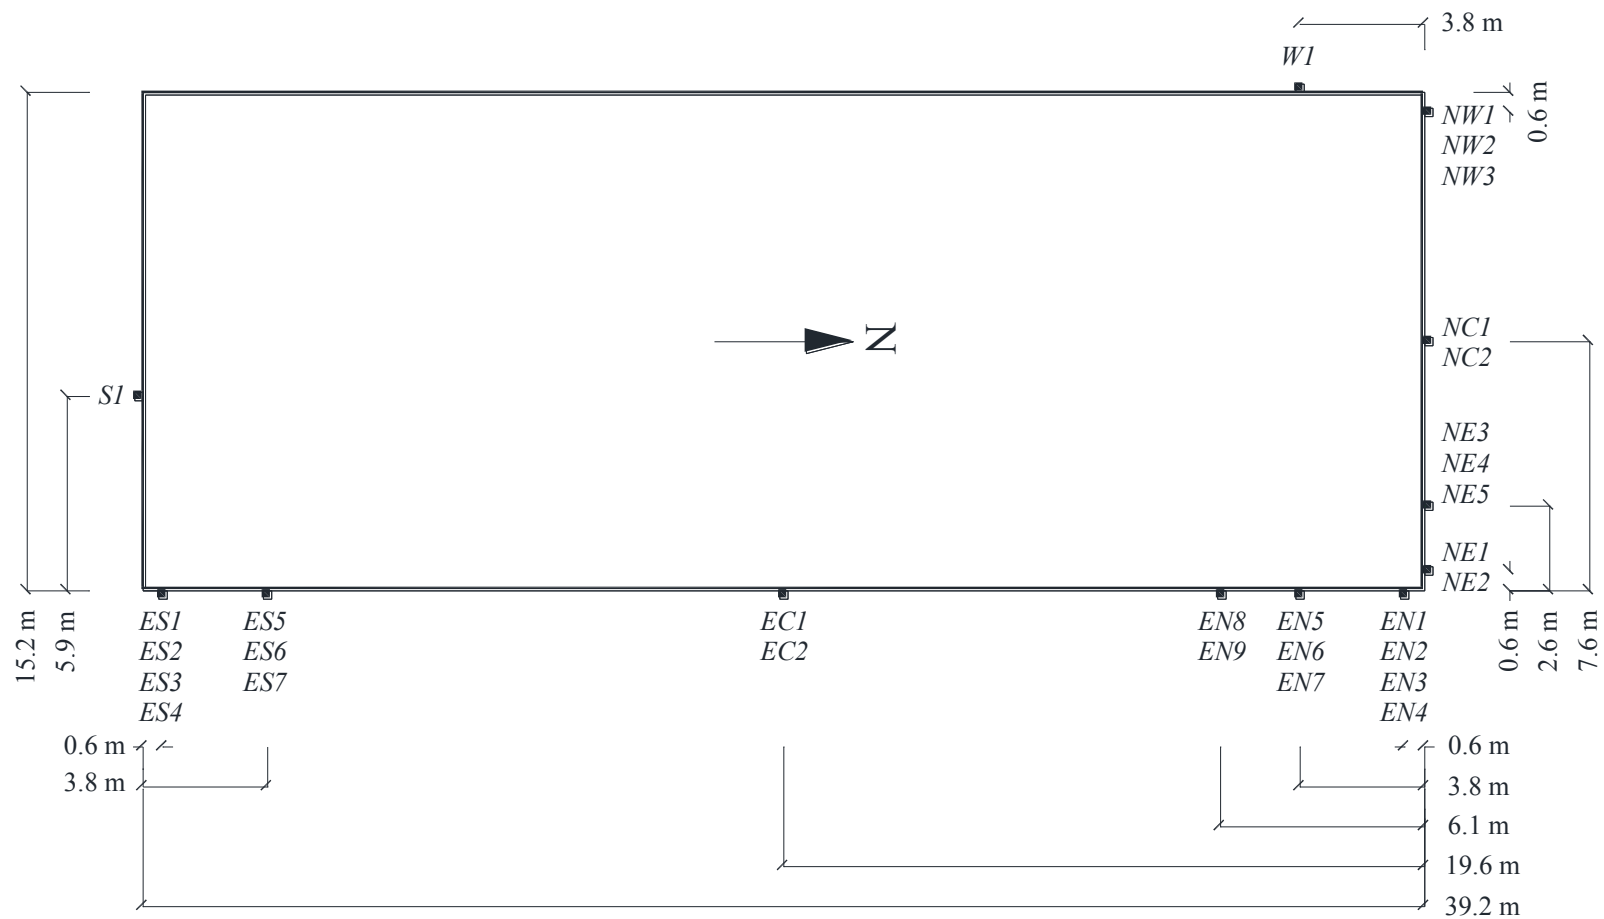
Plan view of the test building and the WDR gauge locations.
